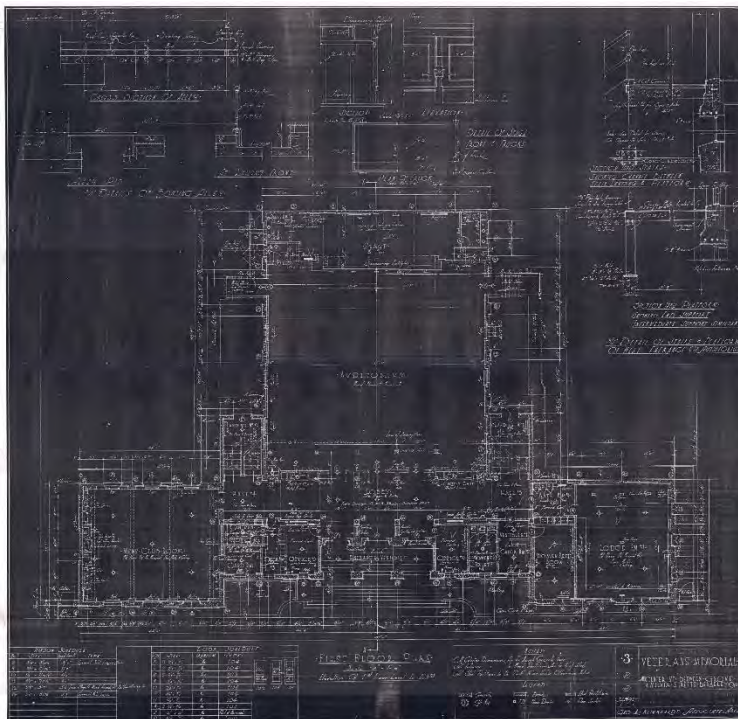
Existing Building drawings – 1<sup>st</sup> Floor Plan
